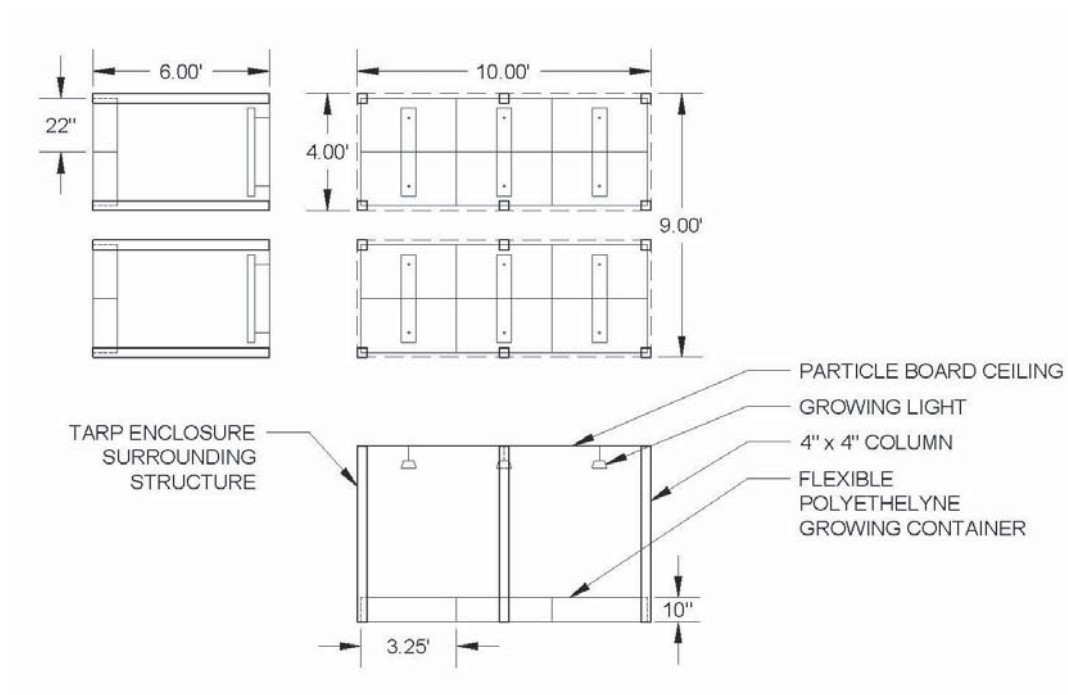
Section, Plan, and Elevation view of greenhouse structure
